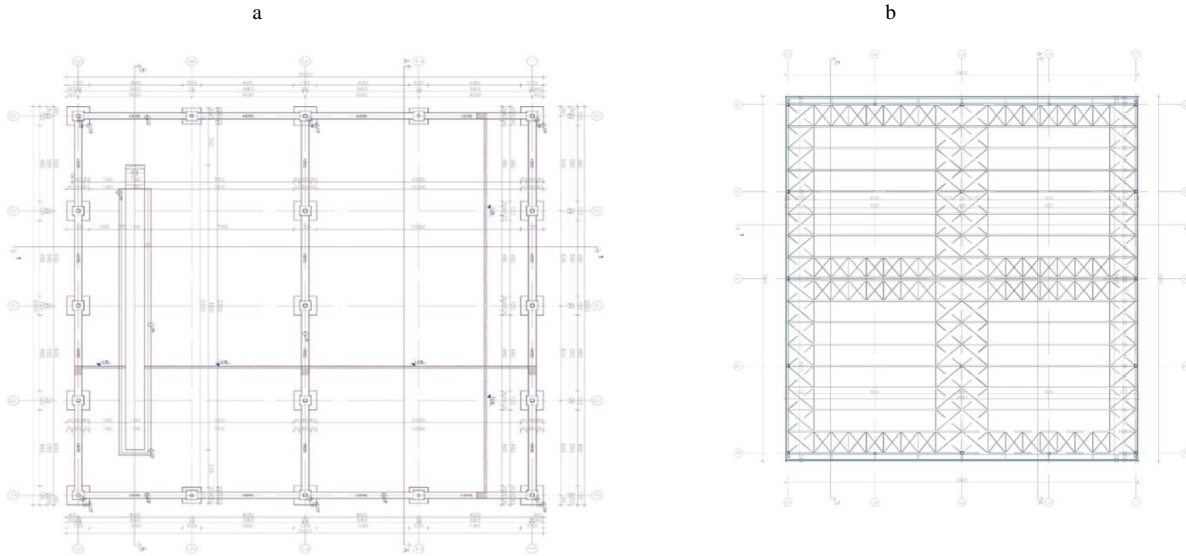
(a) floor processing; (b) foundation of roof construction.
